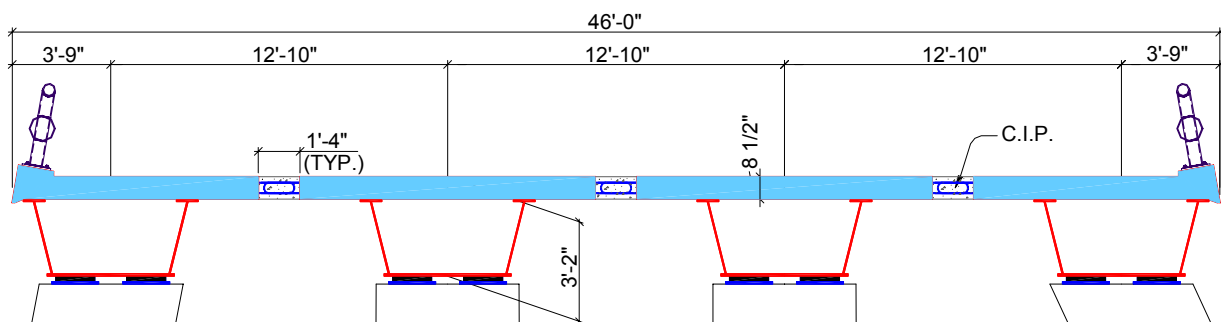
Transverse Section of Steel Tub Beam Bridge
